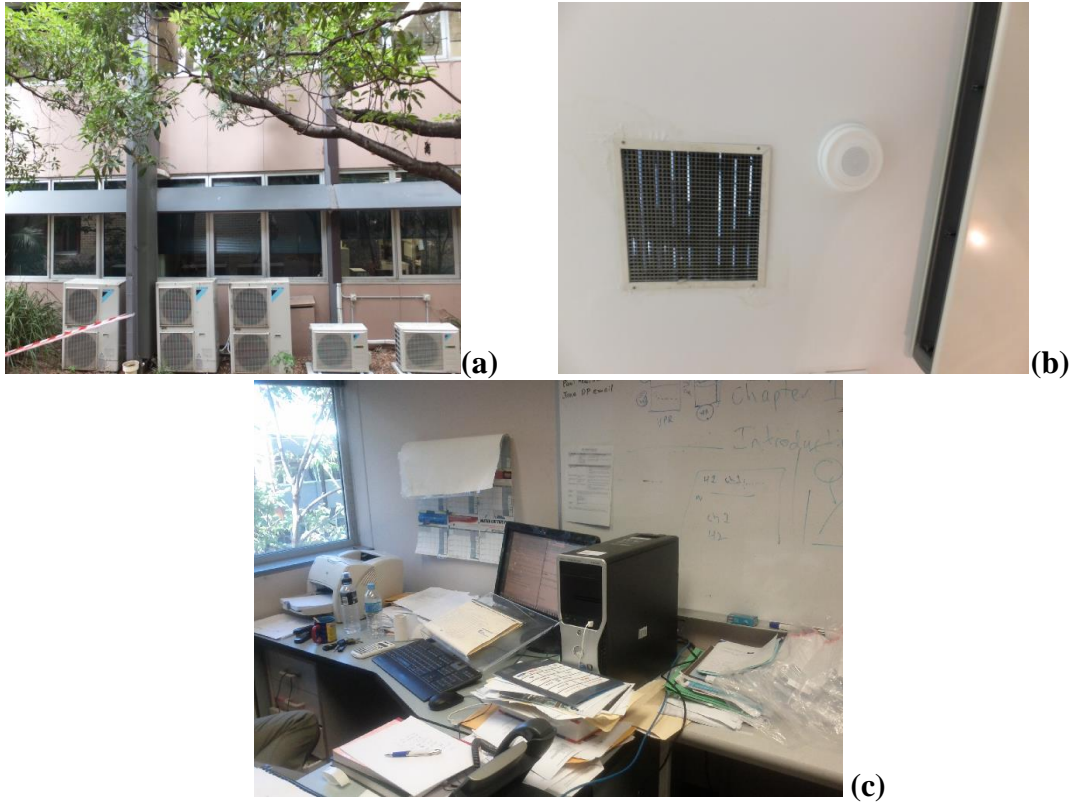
Different parts of the building photographed during the walk through: a) west façade with outdoor air-conditioning units, b) split system mounted in front of an extractor fan, c) Office located in the east wing facing north.
